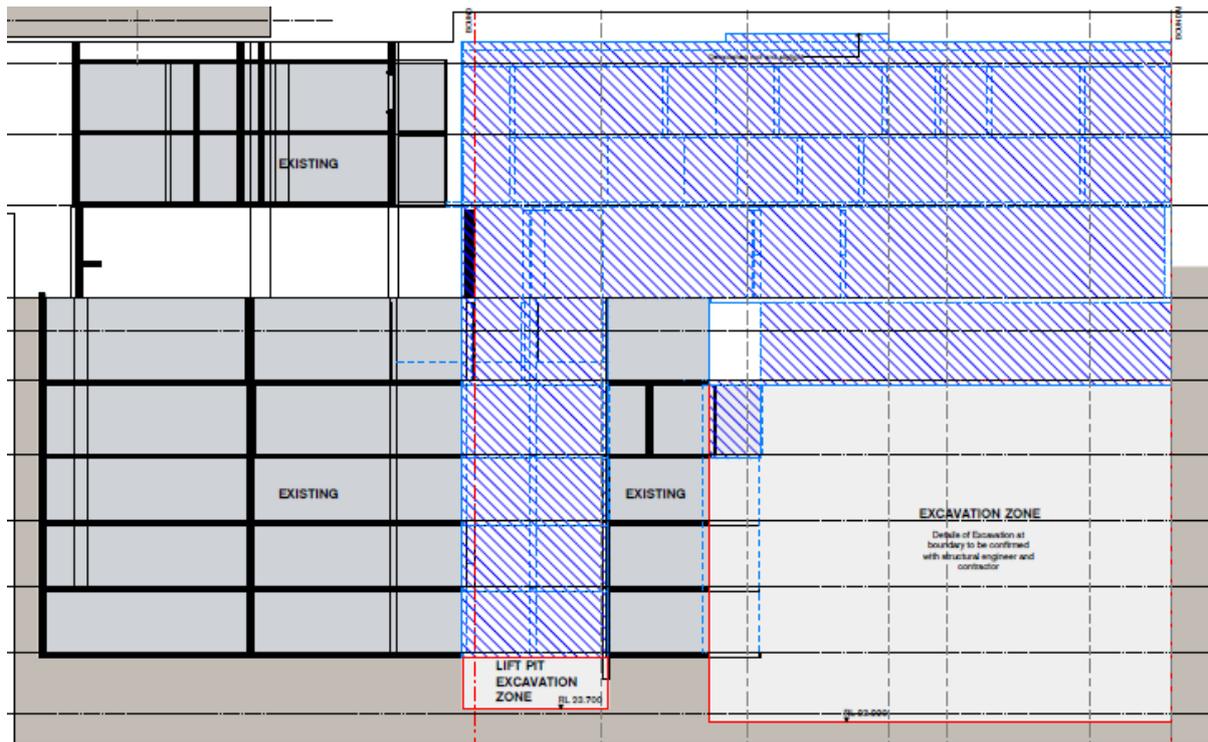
An east-west section plan, illustrating the area of the building to be demolished (in blue) and the extent of excavation below
